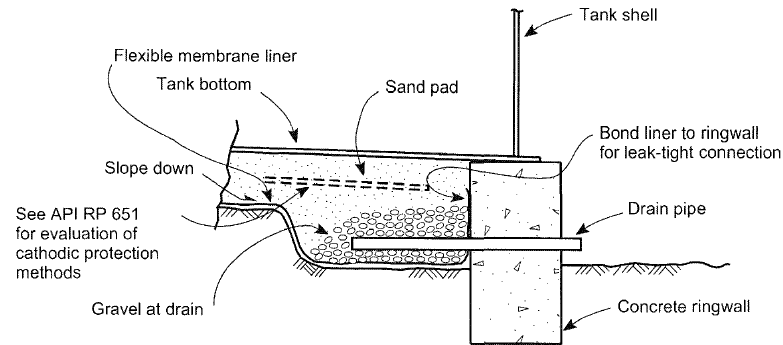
Concrete Ringwall with Undertank Leak Detection at the Tank Perimeter (Typical Arrangement)
